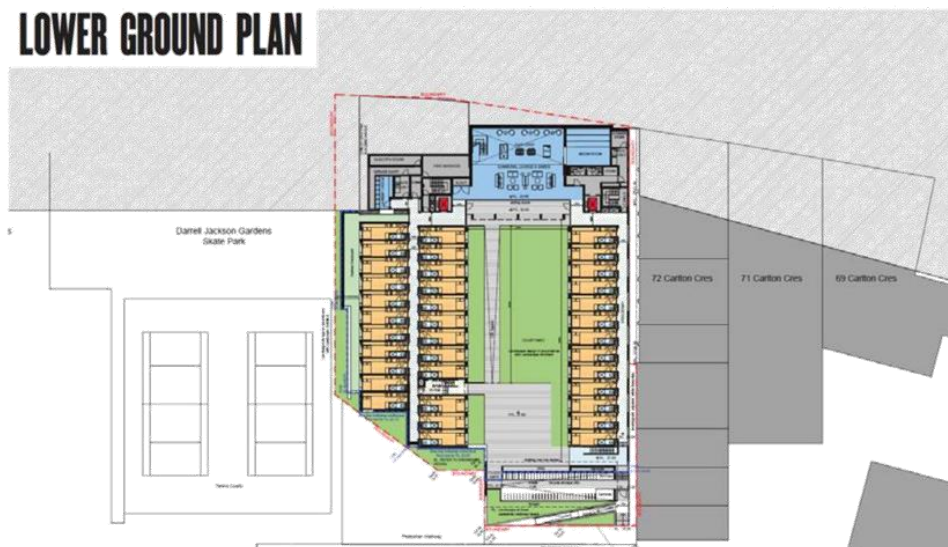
Revised lower ground floor plan detailing the creation of the new flood wall along the western boundary
